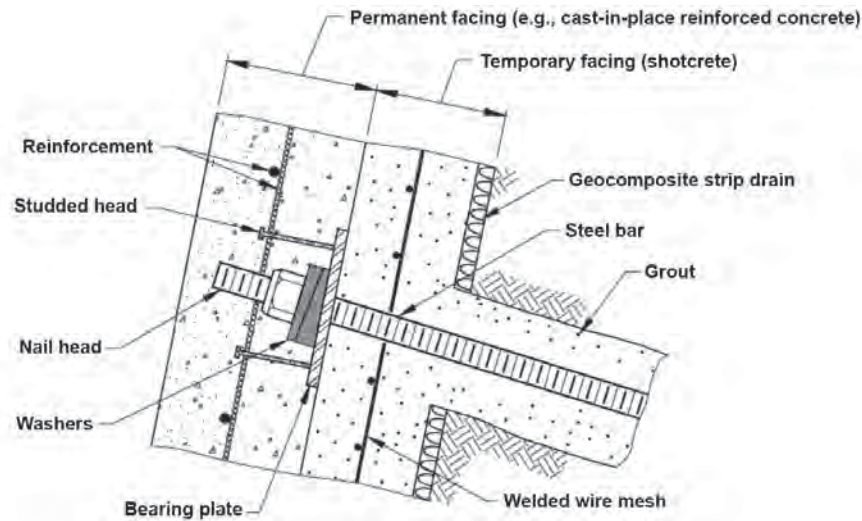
Details of facing connection (Lazarte et al., 2003).
